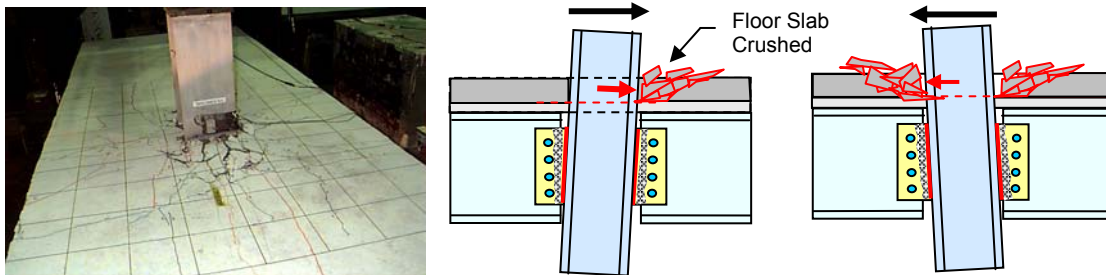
Damage to the Floor Slab during Cyclic Rotation of the Column
